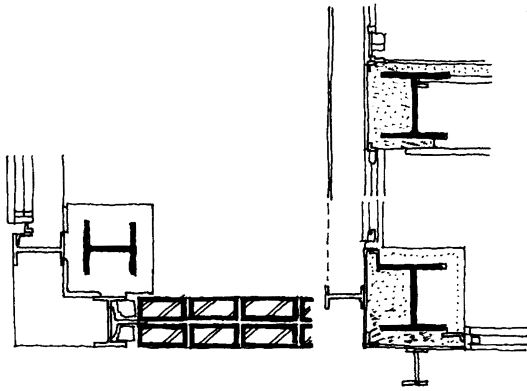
Terry Farrell, Office Building, Soho, London, 1987.
